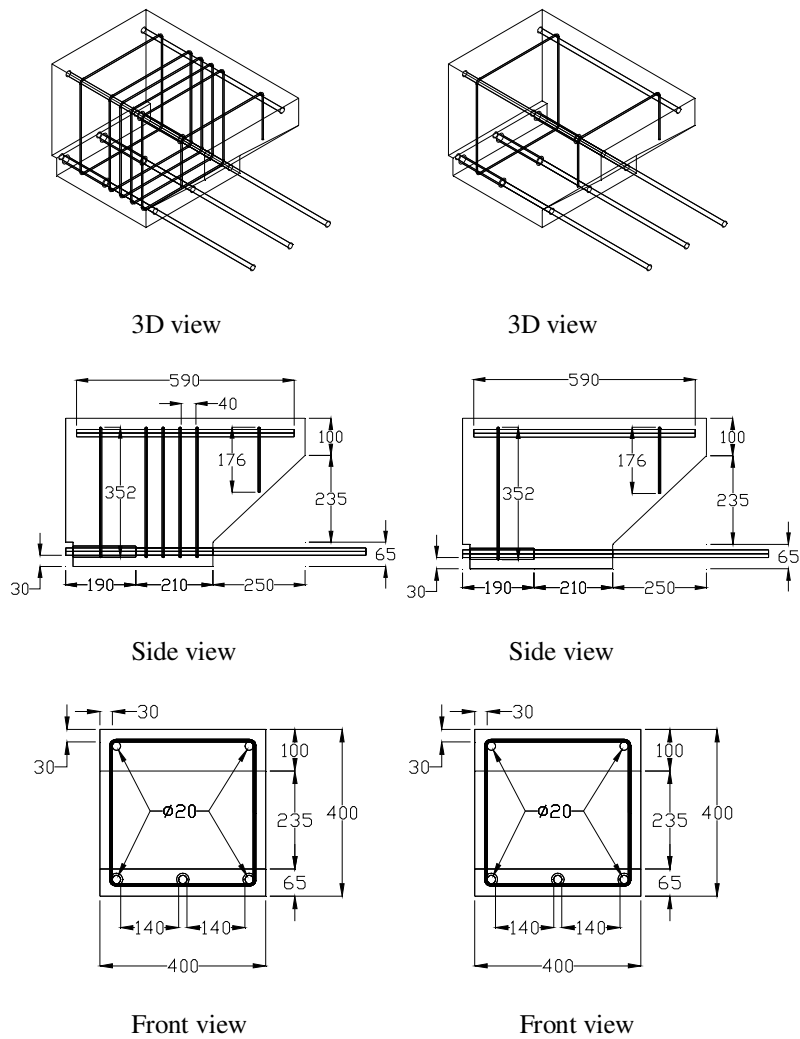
Specimen geometry and reinforcement with transverse reinforcement in the bonded zone of the main reinforcement (left) and without (right).
